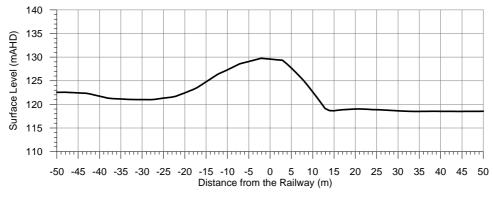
Cross-section through Embankment 74.7 km - Looking East (Up Track)
